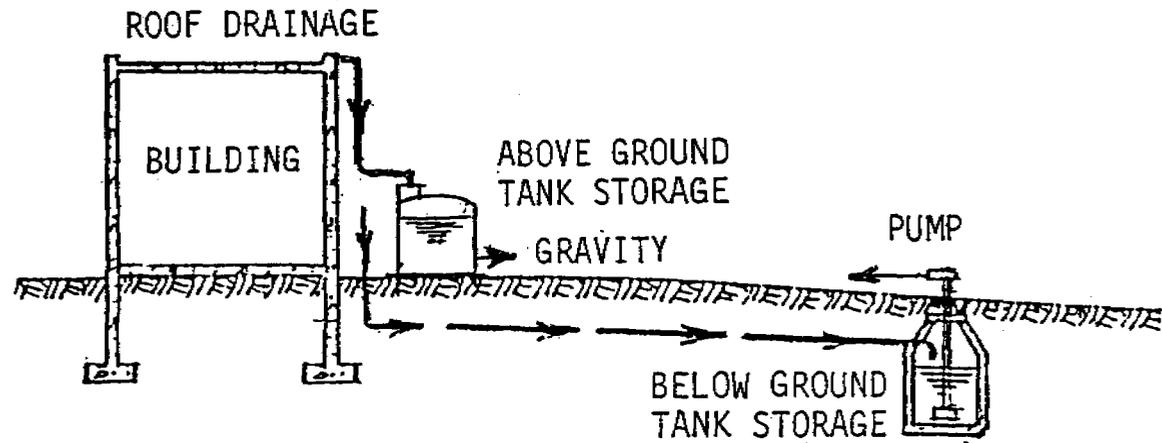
ROOF WATER HARVESTING FACILITY FOR RESIDENTIAL OR COMMERCIAL BUILDINGS
